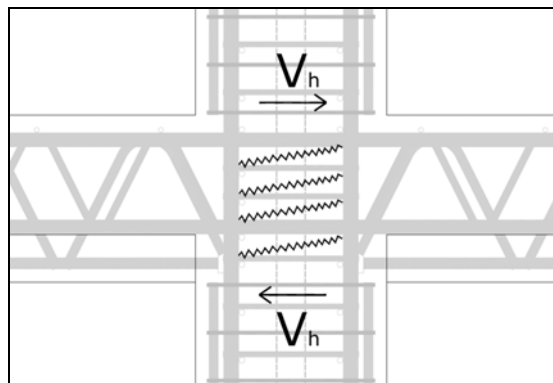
Joint truss mechanism resisting the horizontal shear force
